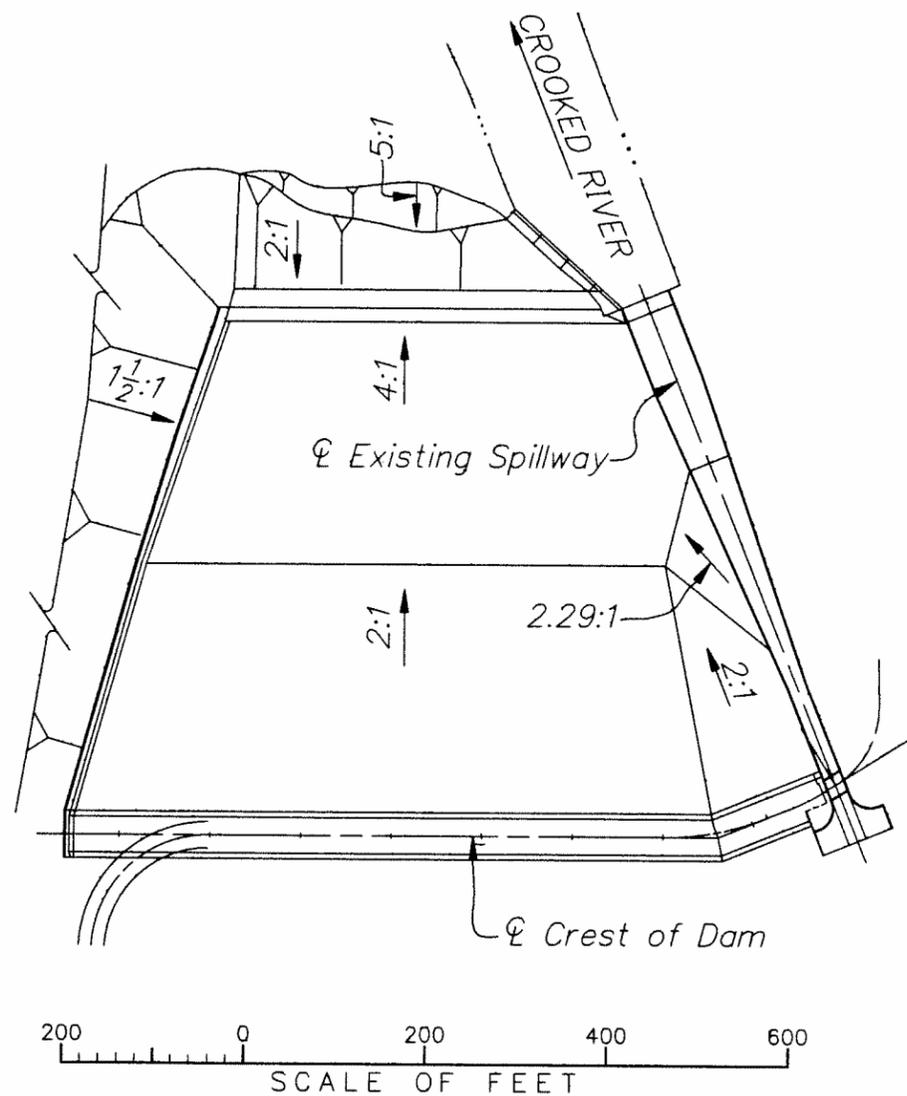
Plan view of the CRCS on downstream face of A. R. Bowman Dam.
